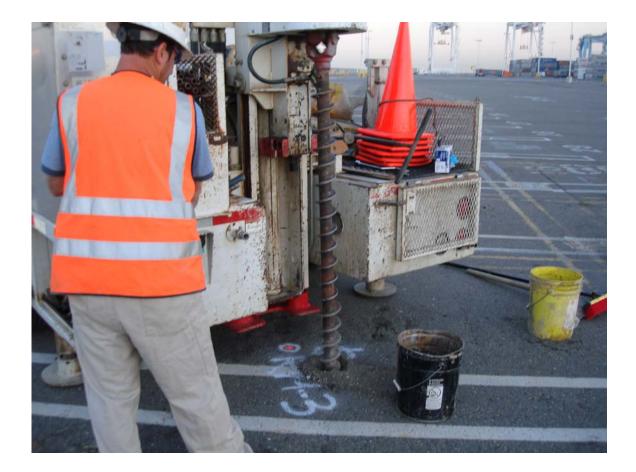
(3/15/07) - Driller using hollow-stem auger to break through pavement prior to hand auguring to 5 ft in RM-3
